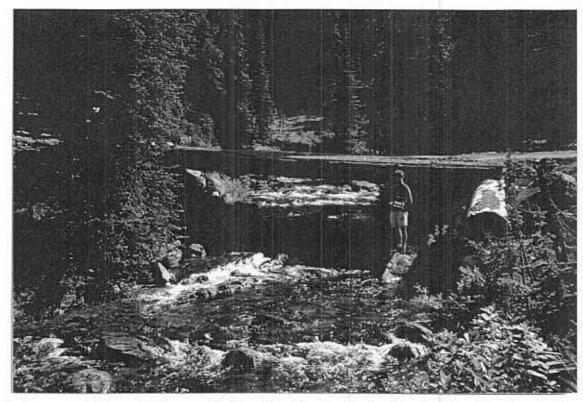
Steel-span (railway cars) bridge with rotting wood deck and erosion of road surface, u/s view.
